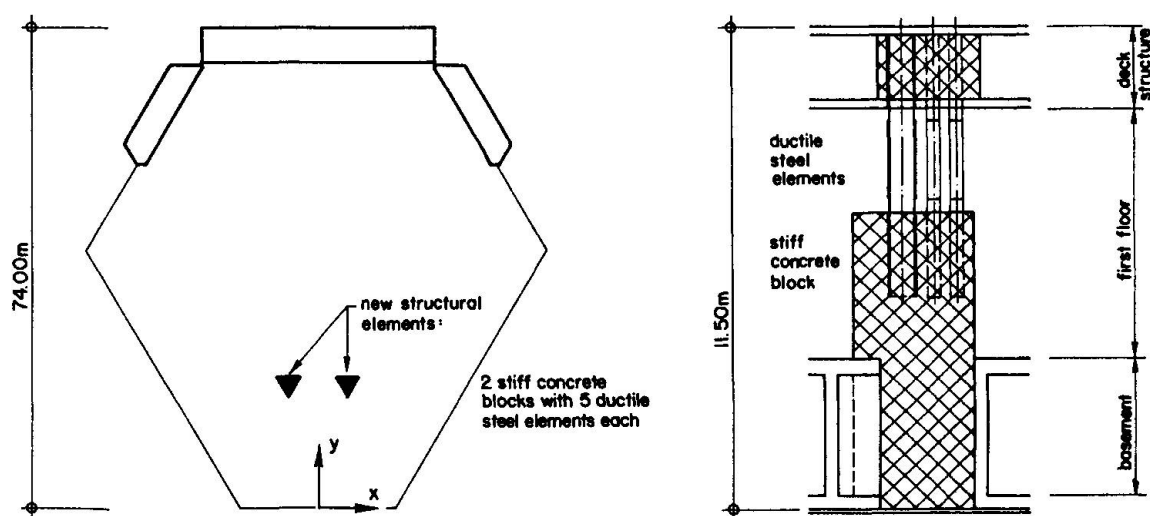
Upgrading variant "capacity design" with ductile steel elements in a stiff concrete block; left: plan view; right: sectional view
